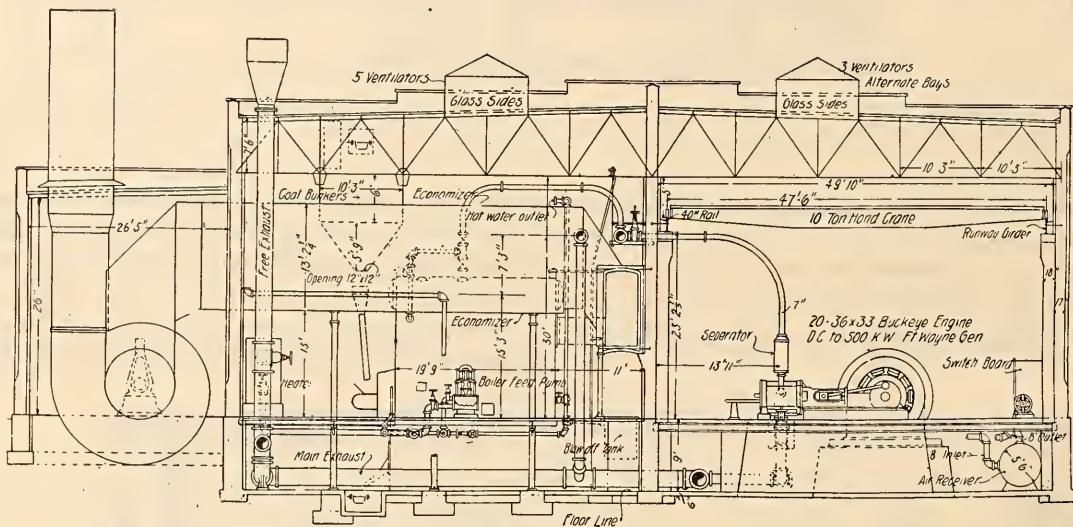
POWER HOUSE CROSS SECTION—NEW SHOPS OF THE ROCK ISLAND SYSTEM AT EAST MOLINE, ILL.
